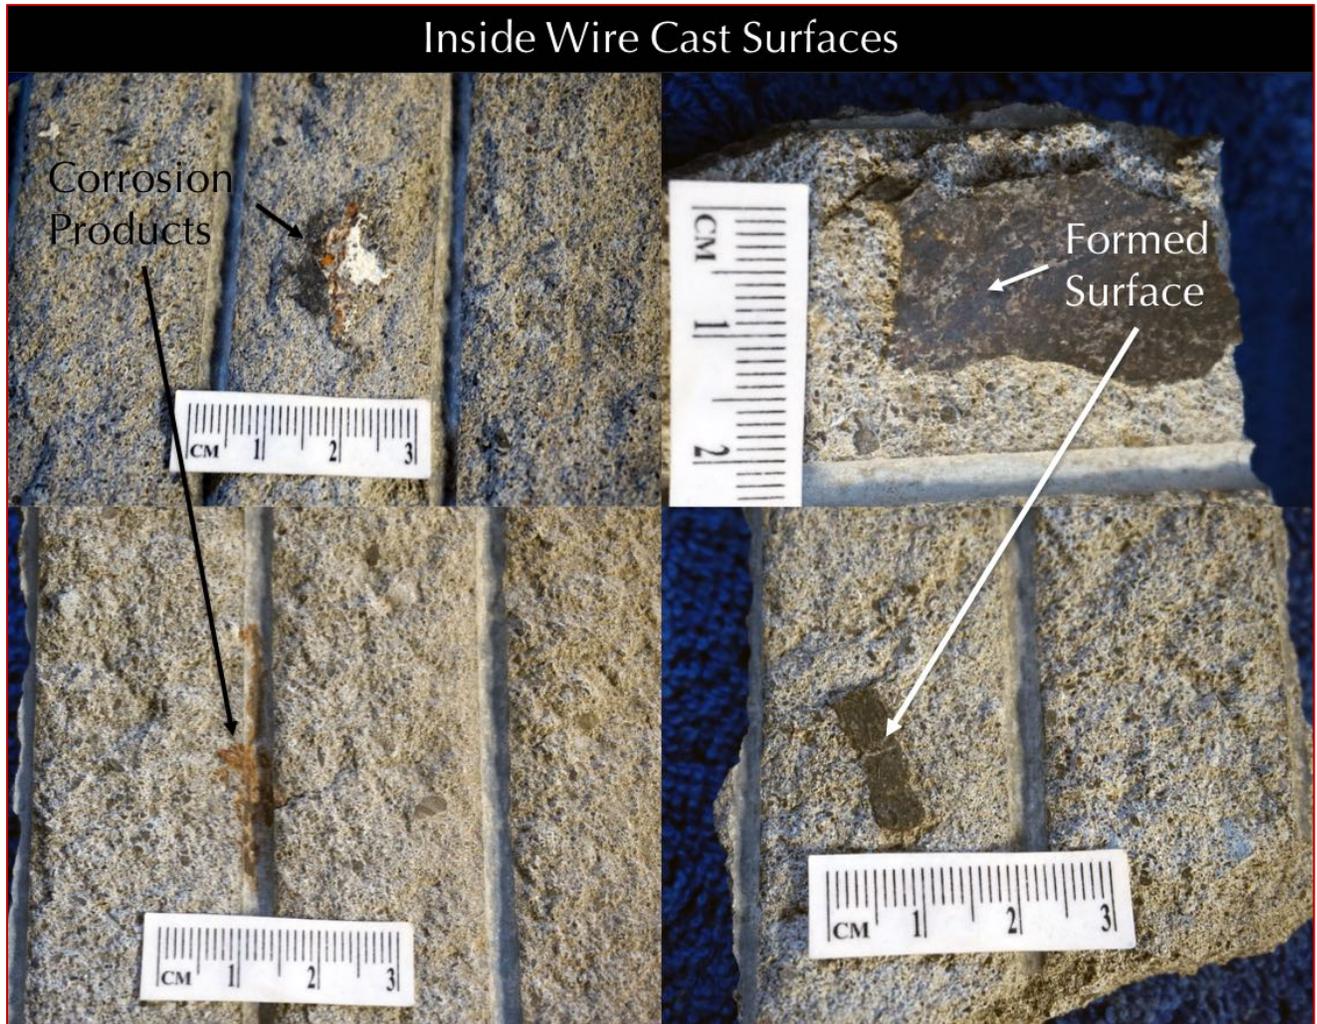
Fresh fractured interior and parallel wire cast surface of pipe showing corrosion products of prestressing wires. The inside wire cast surfaces showing impressions of $\frac{1}{8}$ in. diameter prestressing wires at $1\frac{1}{4}$ -in. center-to-center distances, and have $\frac{1}{16}$ in. thick neat pastes at the wire cast surfaces. The wire cast surfaces are smooth, shiny, medium gray, and have lower water-cement ratios (w/c is estimated to be less than 0.40 to 0.45 in the $\frac{1}{16}$ in. of the neat pastes of wire cast surfaces).
